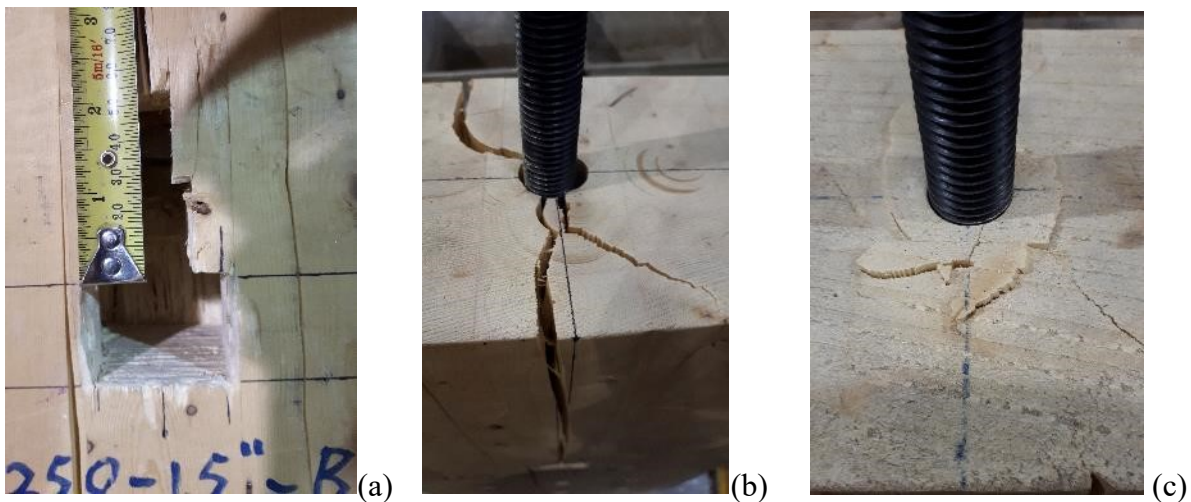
Wood crushing failure with associated failures at the end of the tests: (a) Wood crushing failure; (b) Wood splitting failure; (c) Rod pull-out failure.
